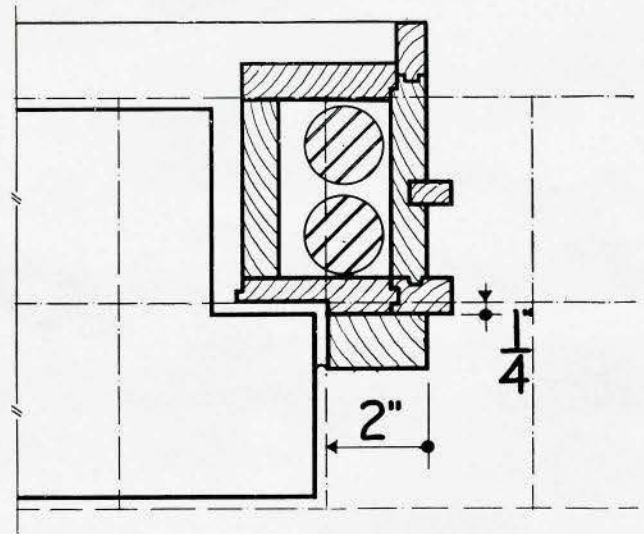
Large-scale view of jamb with window frame in detail and masonry jamb in profile; sash face of frame 2 in. from grid line at opening.
